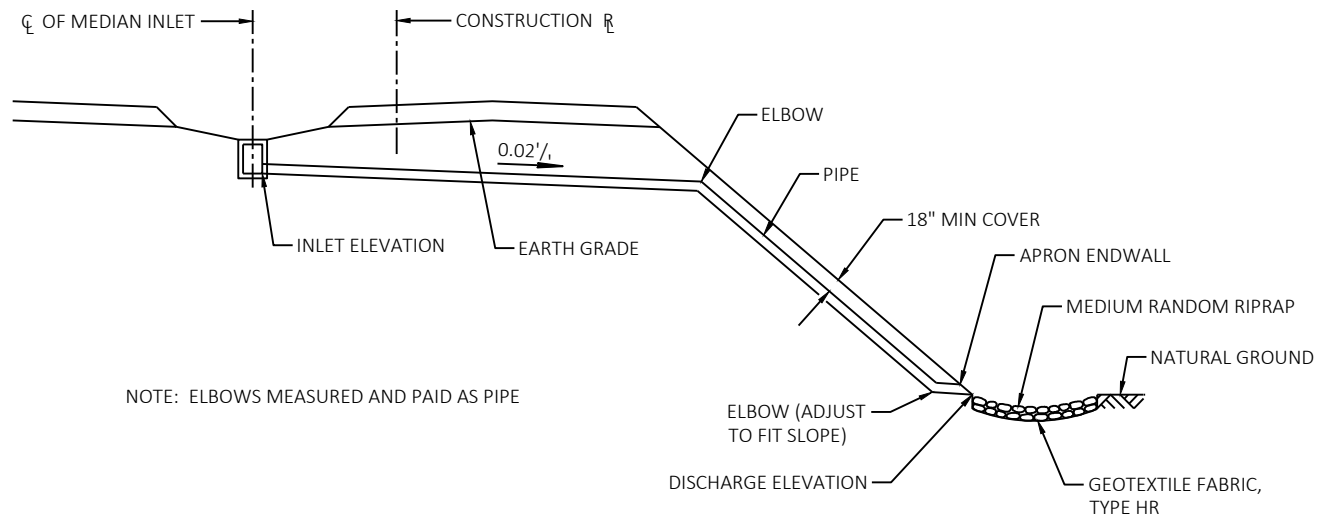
DETAIL FOR EXTENSION OF UNDERDRAIN OUTFALLS
